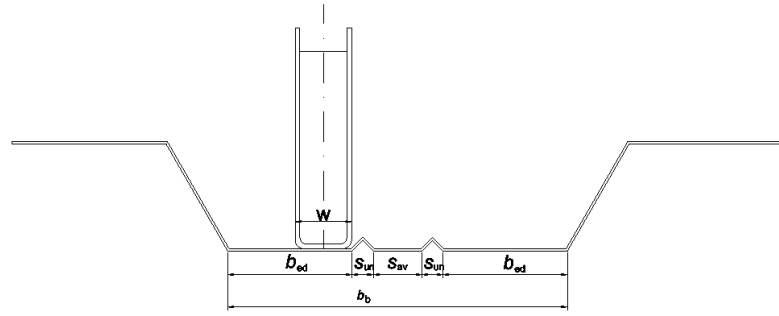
Transverse sheeting with two rib stiffeners and transverse connectors.
